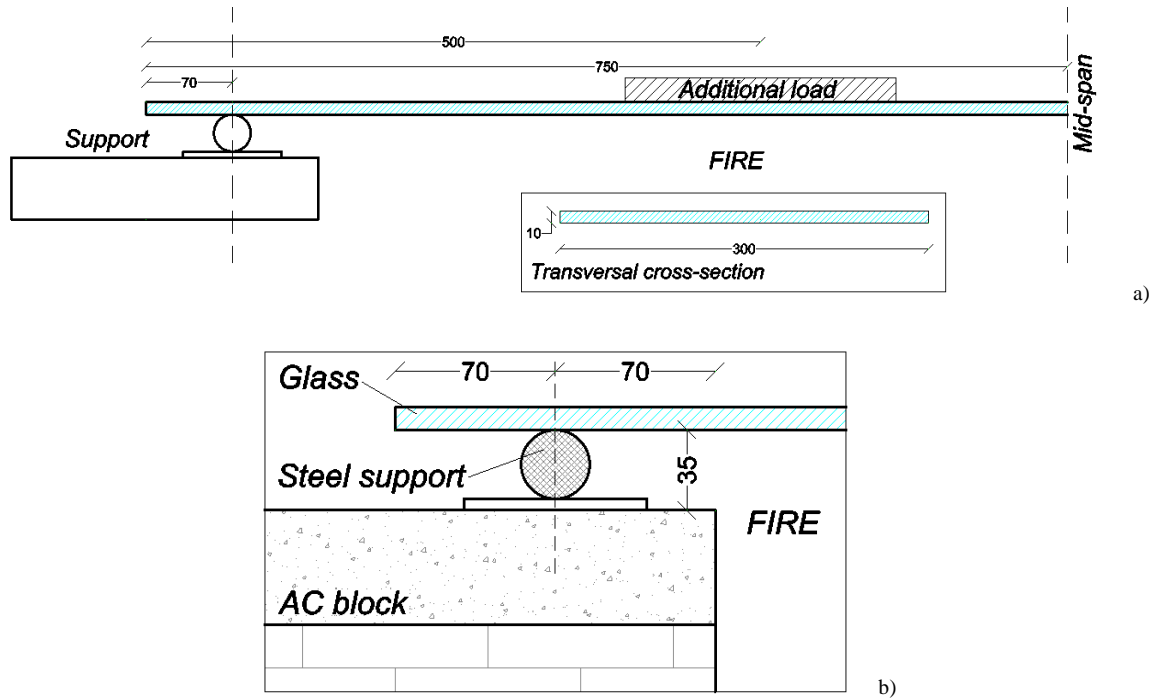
Test setup (lateral view), with b) supports detail (cross-section). Nominal dimensions in mm.
